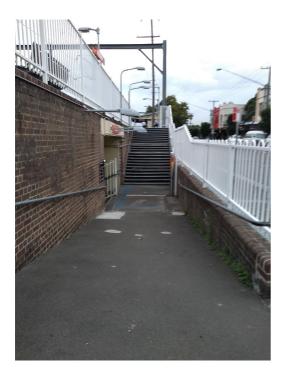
Entrance to subway on Railway Street, facing south (Source: Jacobs 2020)
